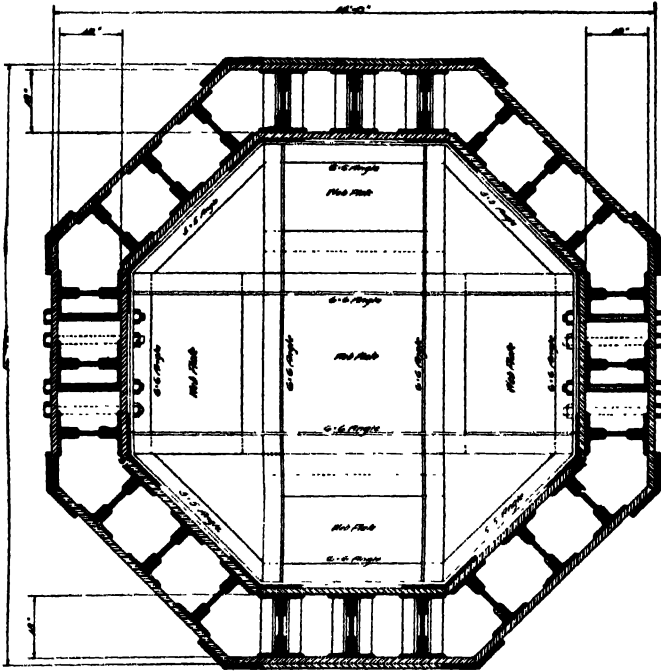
k. Typical Cross-section of Compression Chord for Proposed Cantilever Bridge over San Francisco Bay.
